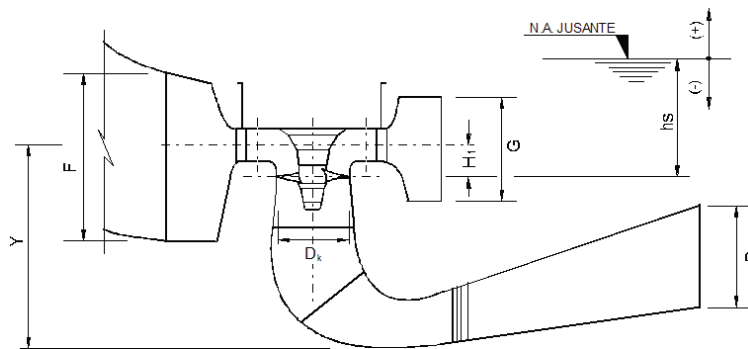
Cross-section of semi-spiral casing and draft tube – Kaplan turbine with semi-spiral casing made of concrete.
